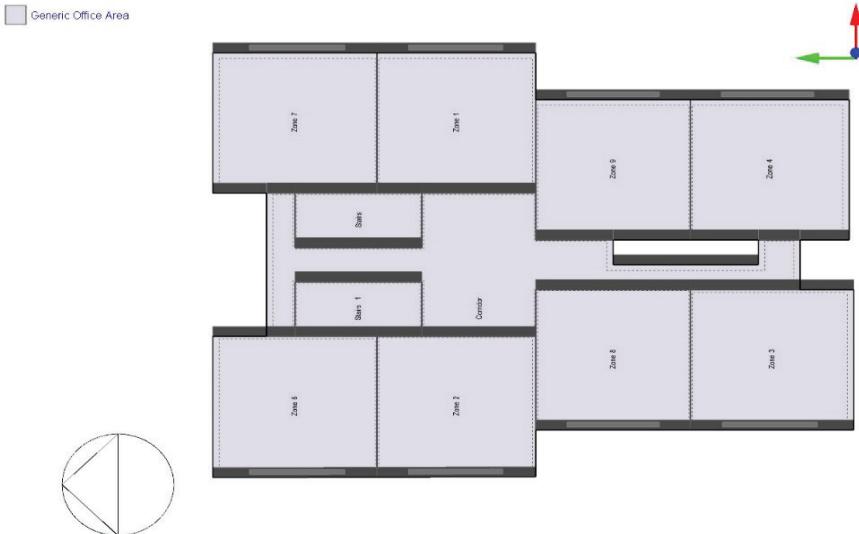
Case Study Building Thermal Model Typical Floor Plan
